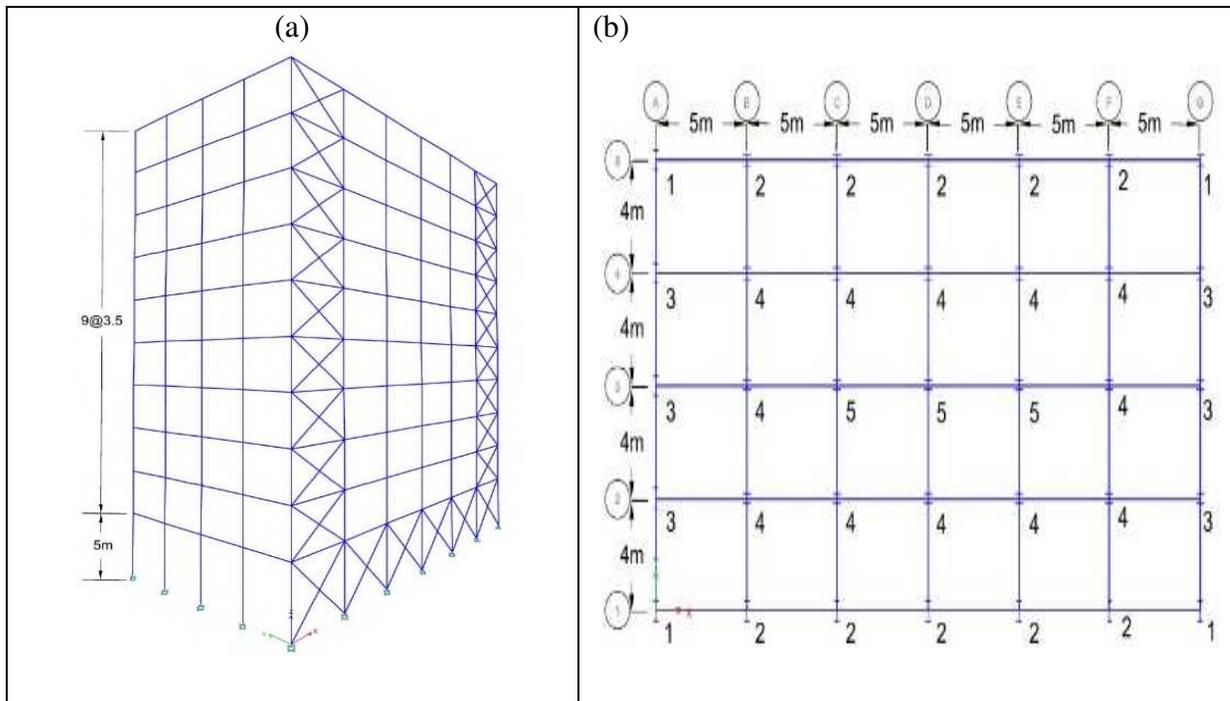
10-story 1026-element frame : (a) 3D view; (b) plan view and column groupings.
